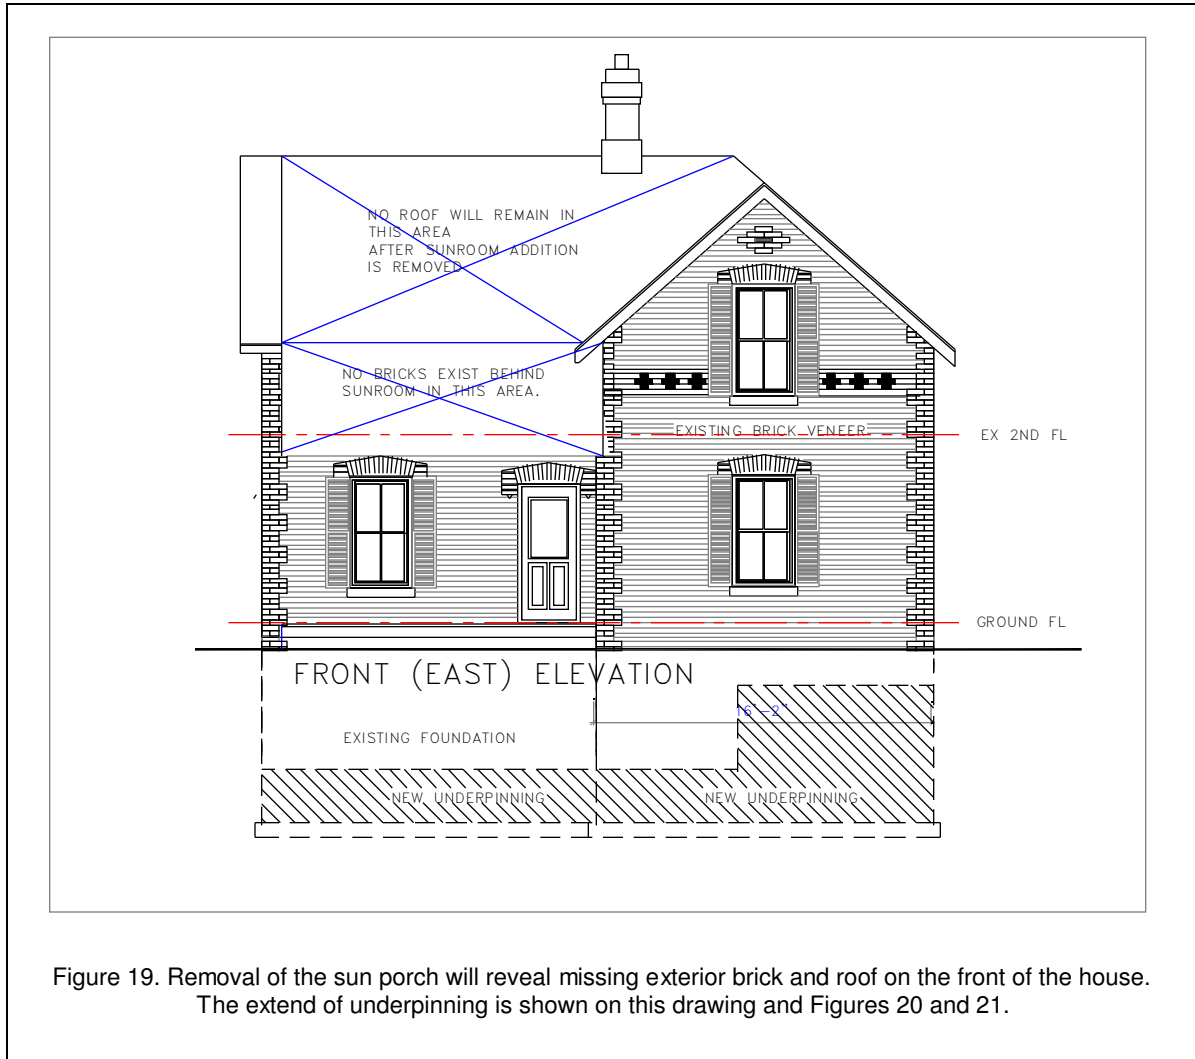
Removal of the sun porch will reveal missing exterior brick and roof on the front of the house. The extend of underpinning is shown on this drawing and Figures 20 and 21.
